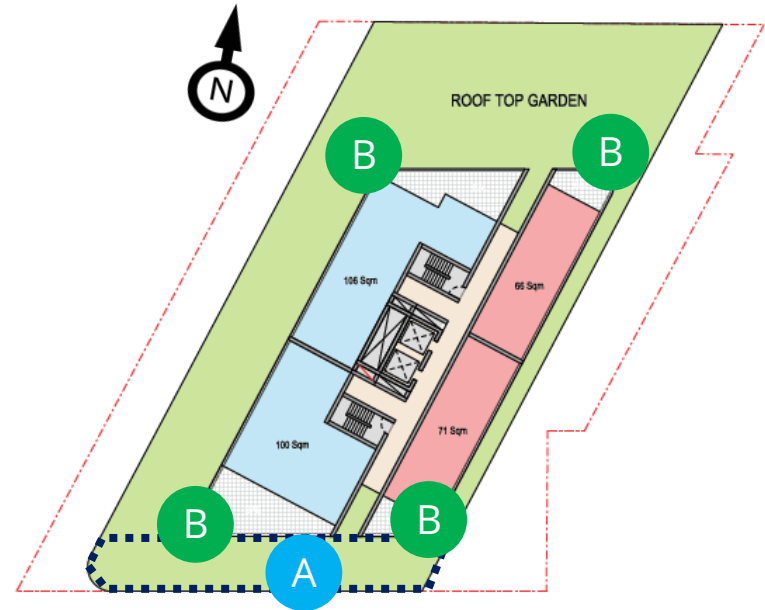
Site plan showing key pedestrian areas at Level 2 roof terrace
